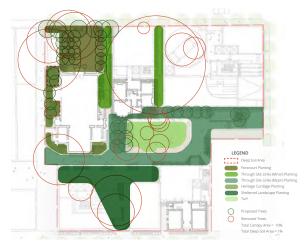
"Planting Approach - Ground" plan from Landscape Report (Yerrabingin, 2024).
